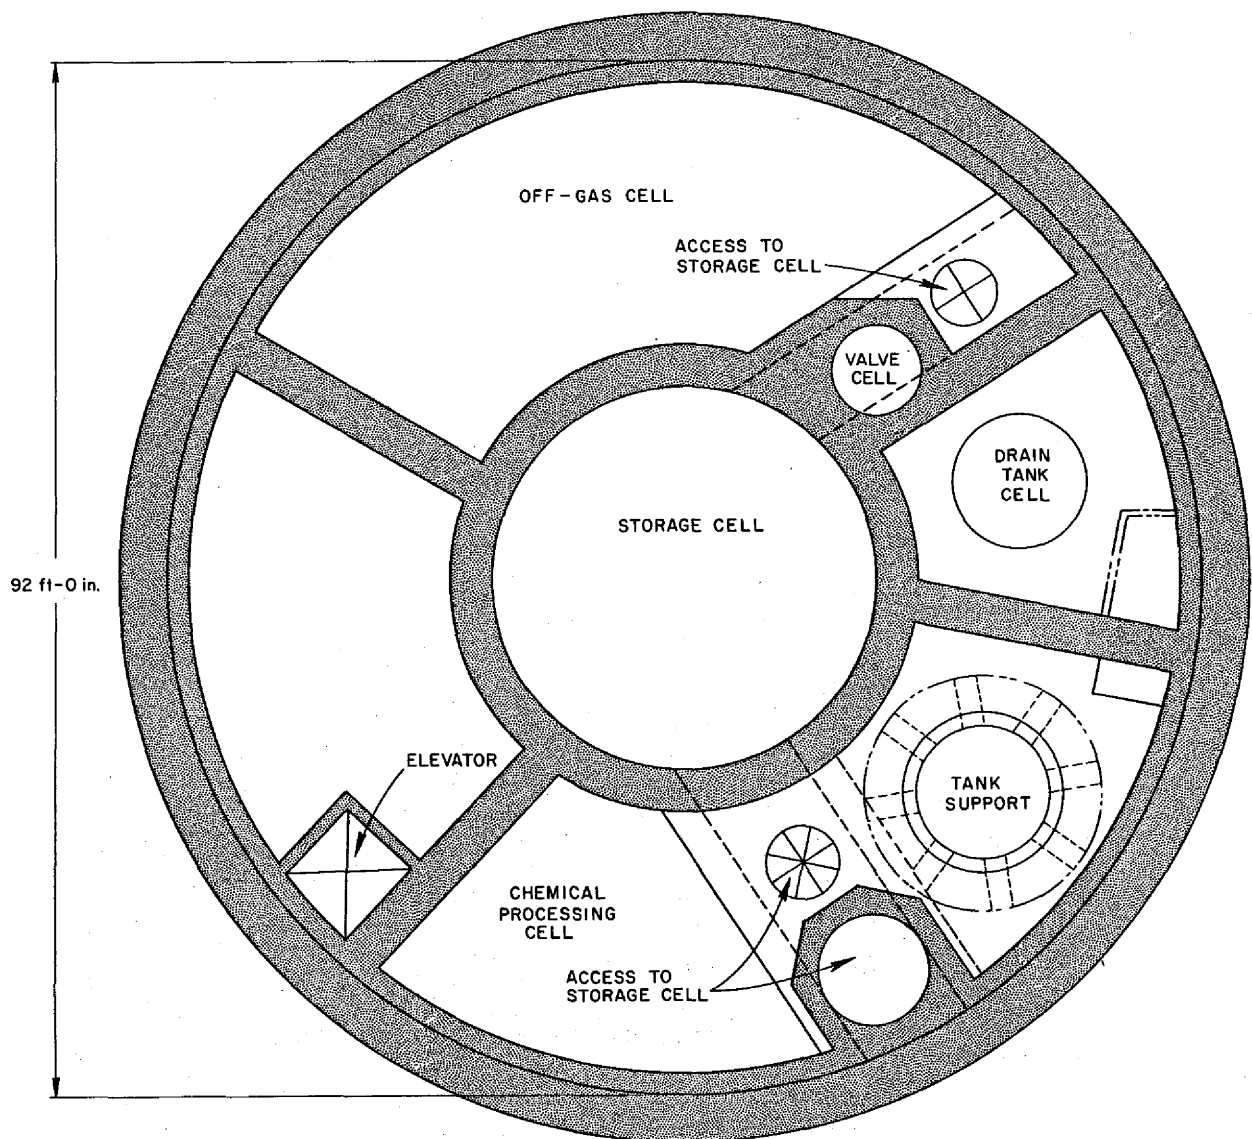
Plan View, First Floor of Confinement Building, Section AA.
